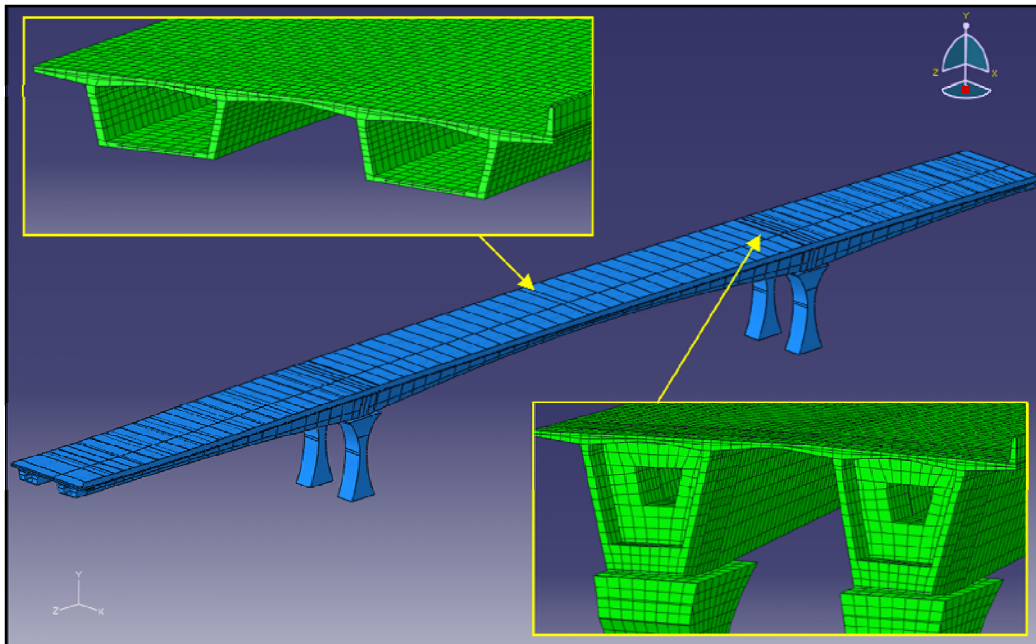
FINITE ELEMENT MODEL OF I35W ST. ANTHONY FALLS BRIDGE
